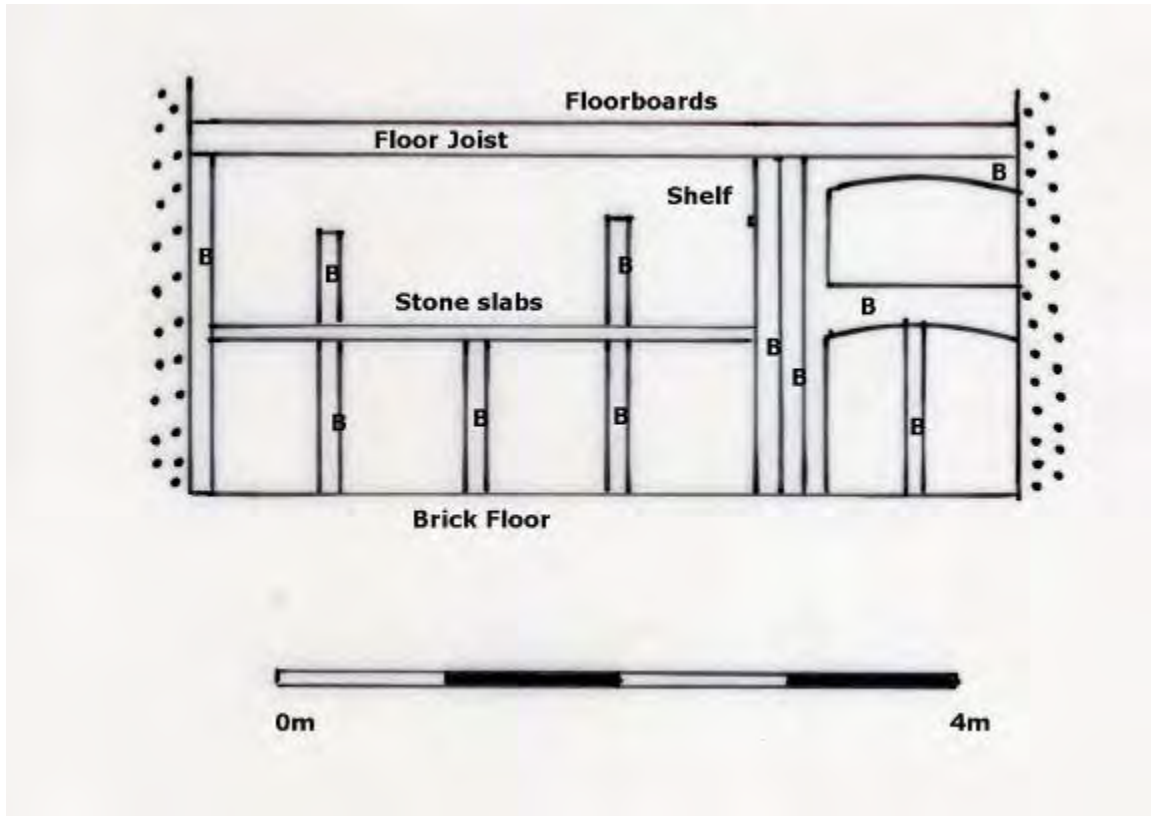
Annotated elevation of wine bins built against east wall of cellar
